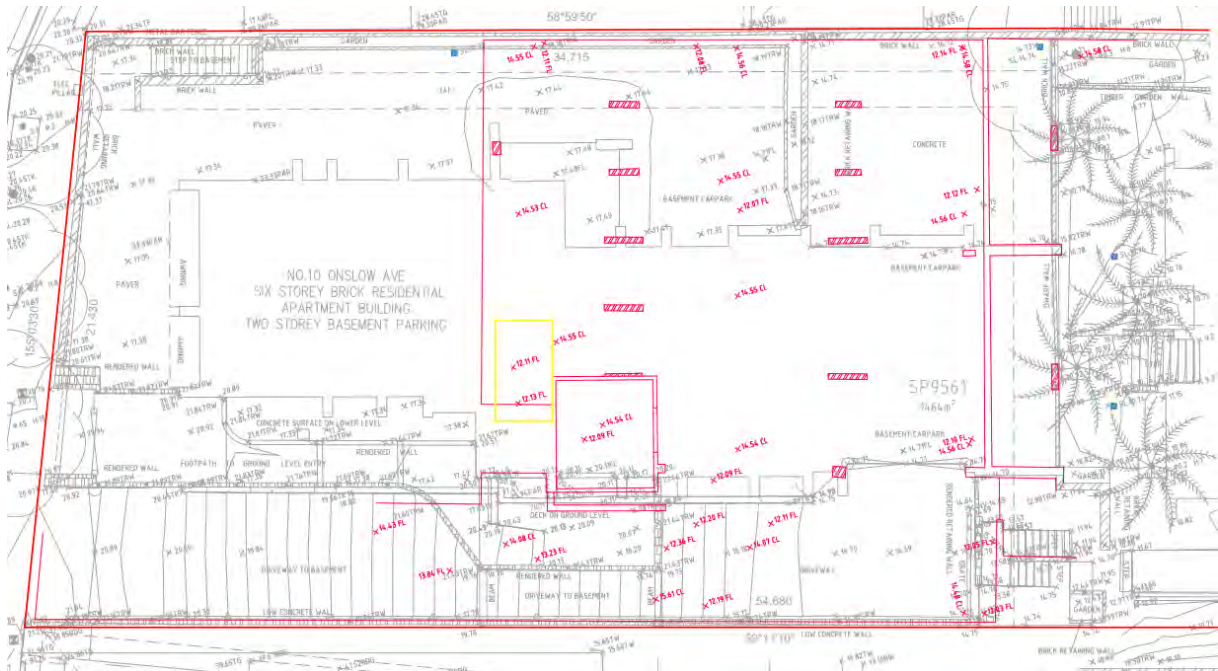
Excerpt of Survey Plan for Level 2 Basement Parking of the existing site. The existing ground level below the highest point of the building is outlined in yellow for the Onslow Avenue building.
